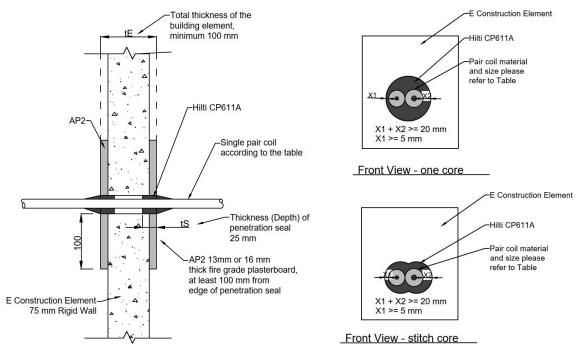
Single pair coil penetrating minimum 75 mm thick rigid wall with build-up
